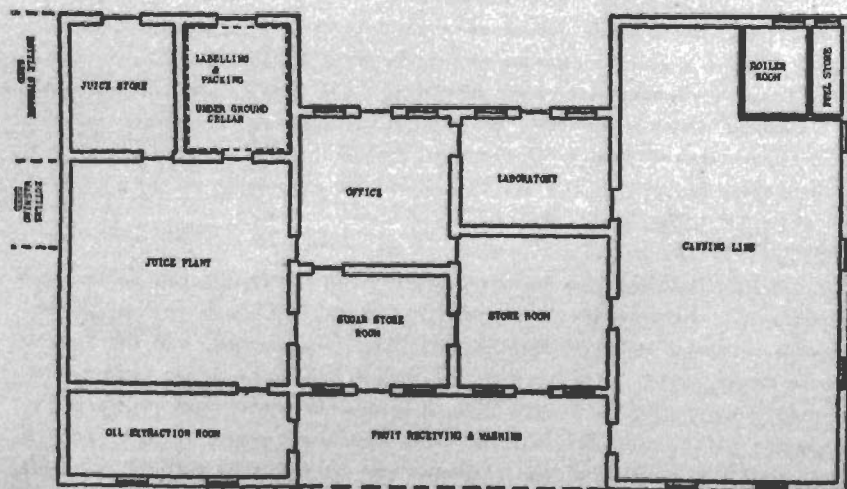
PLAN OF A FRUIT PRESERVATION FACTORY
